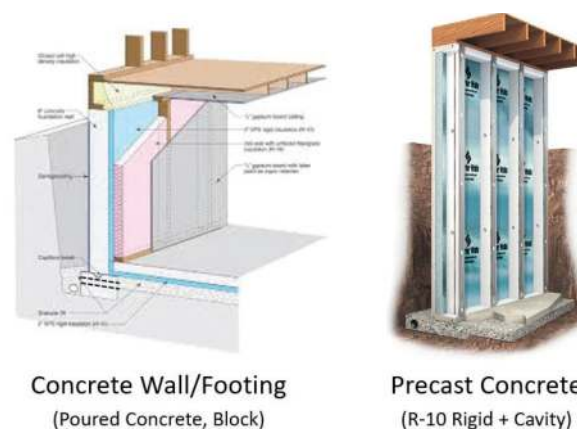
A comparison of pour-in-place and precast concrete foundations.
